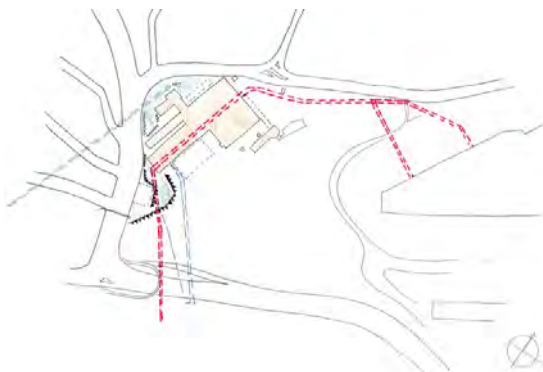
(left): Inlet canal is part of the coolant water system shown red on the plan above (Plan by Design 5).
